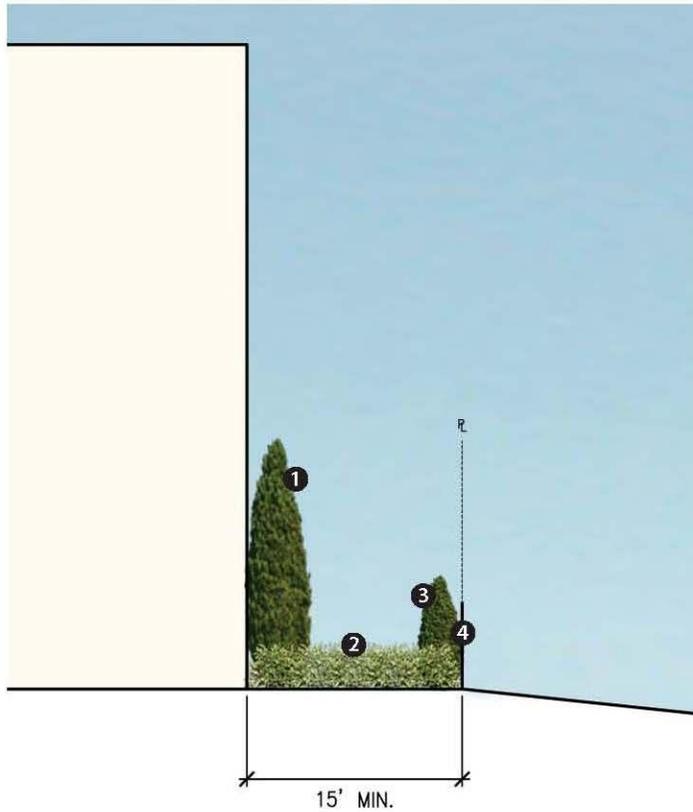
I-15/I-215 Edge Condition at Back of House Loading
